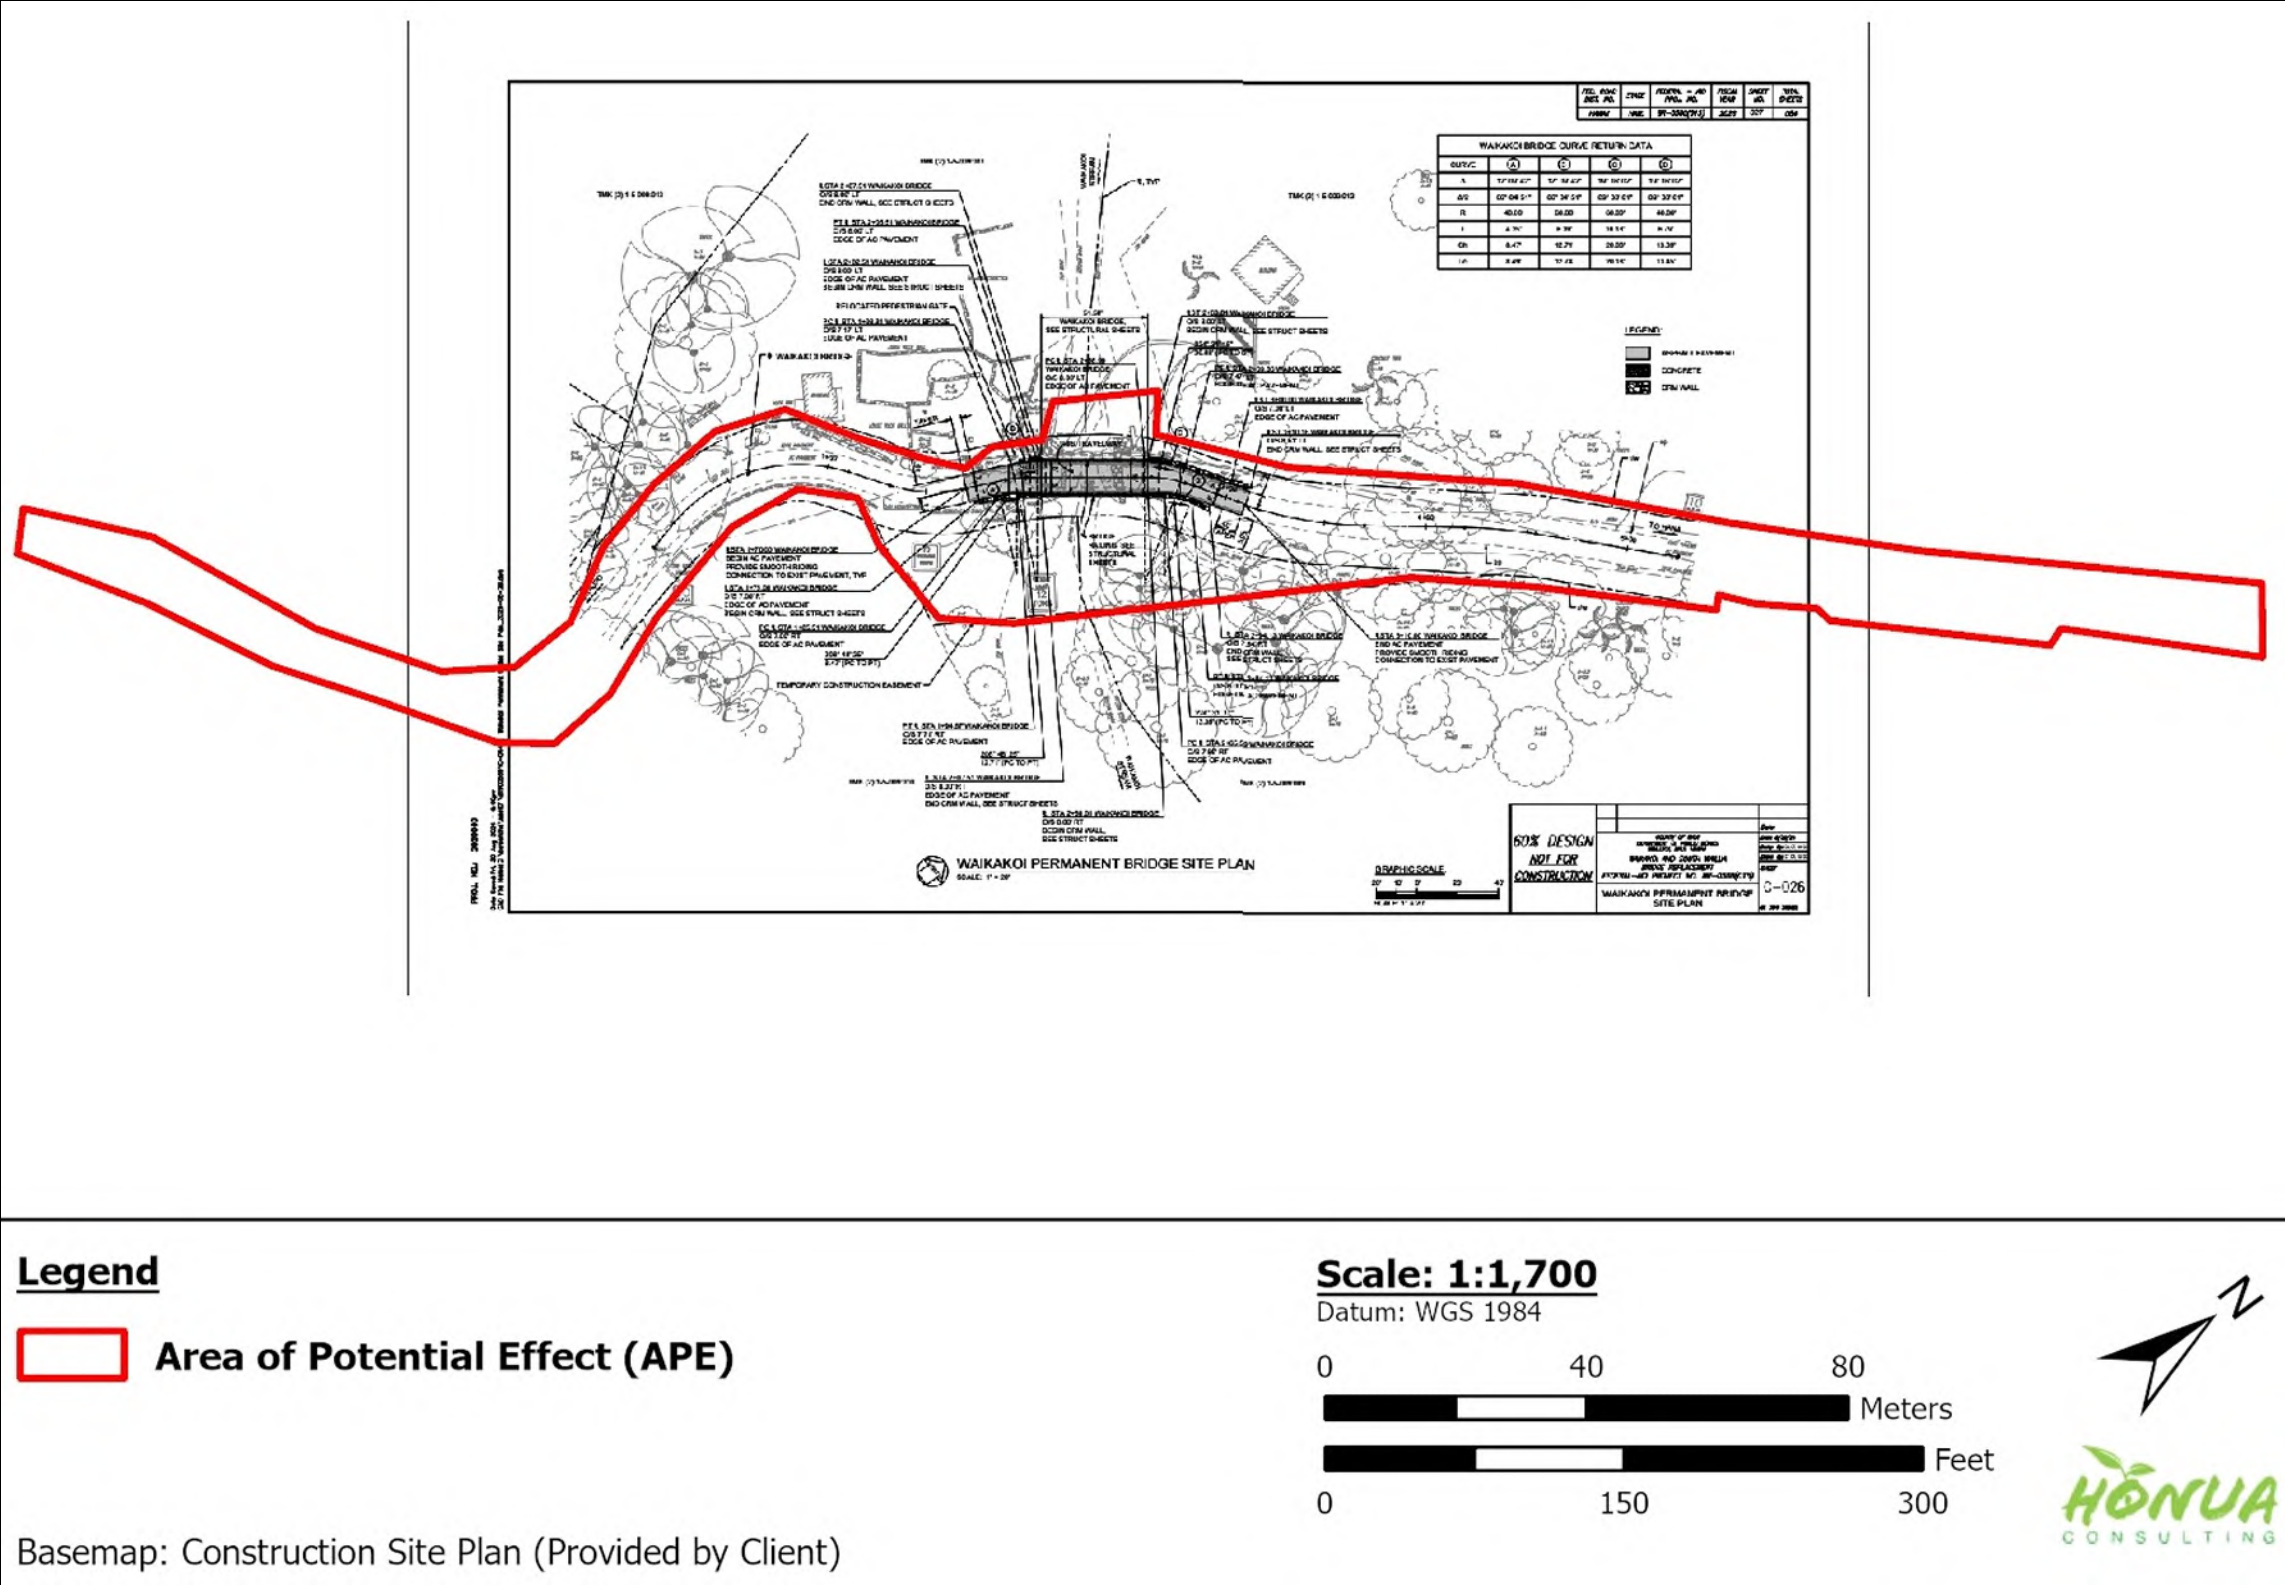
Construction site plan for Waikakoi Bridge APE (base image provided by client); note, the area of construction and potential ground disturbance is indicated by the limits of the construction drawing; the APE extends further than the construction drawing to indicate areas where temporary traffic control warning signage will be placed
